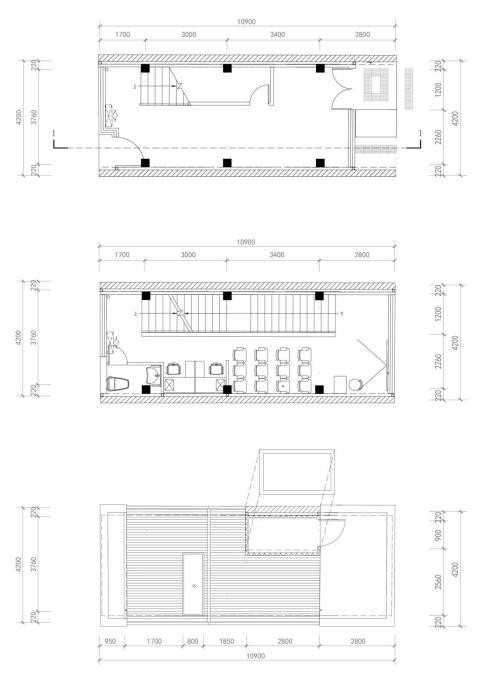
First, second and third floor plan Source: Author's own drawing
